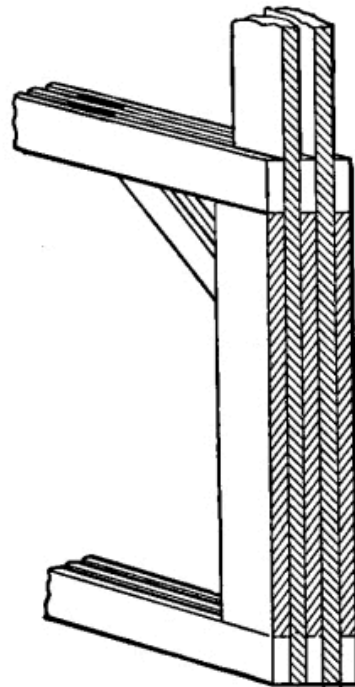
Detail Showing Section of Frame.—Scale, $\frac{1}{4}$ Inch to the Foot.
